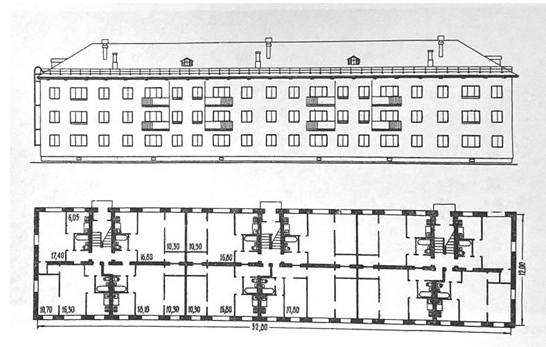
Elevation and first floor plan of model I-447C-1 for thirty-six flats (1957). Source: Meuser and Zadorin 2016.
